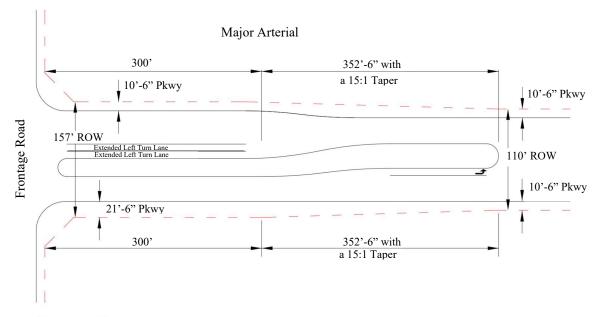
Major Arterial Thoroughfare Intersection with Frontage Road
